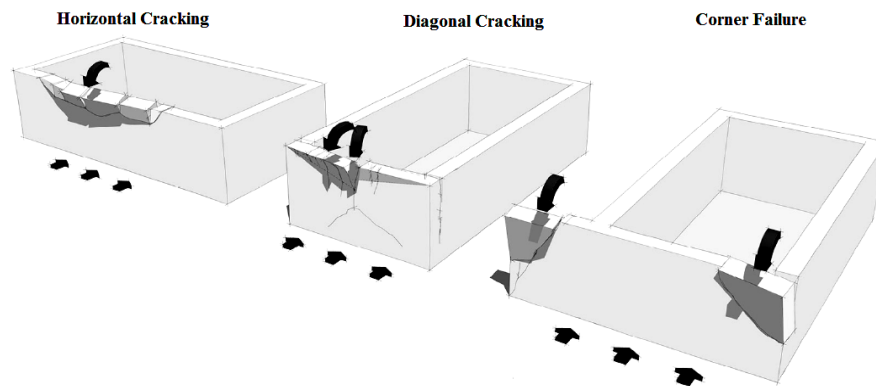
Typical out-of-plane failures of vernacular dwellings (Correia *et al.*, 2015)
